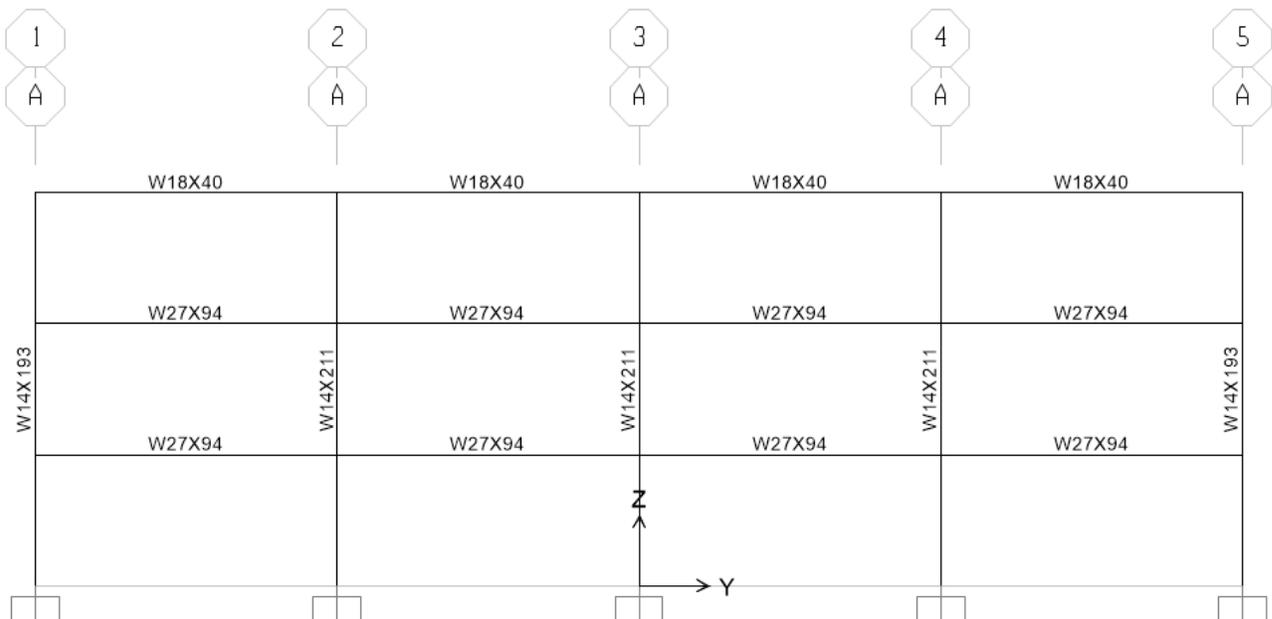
Elevation View of Three-Story Moment Frame as Beam
